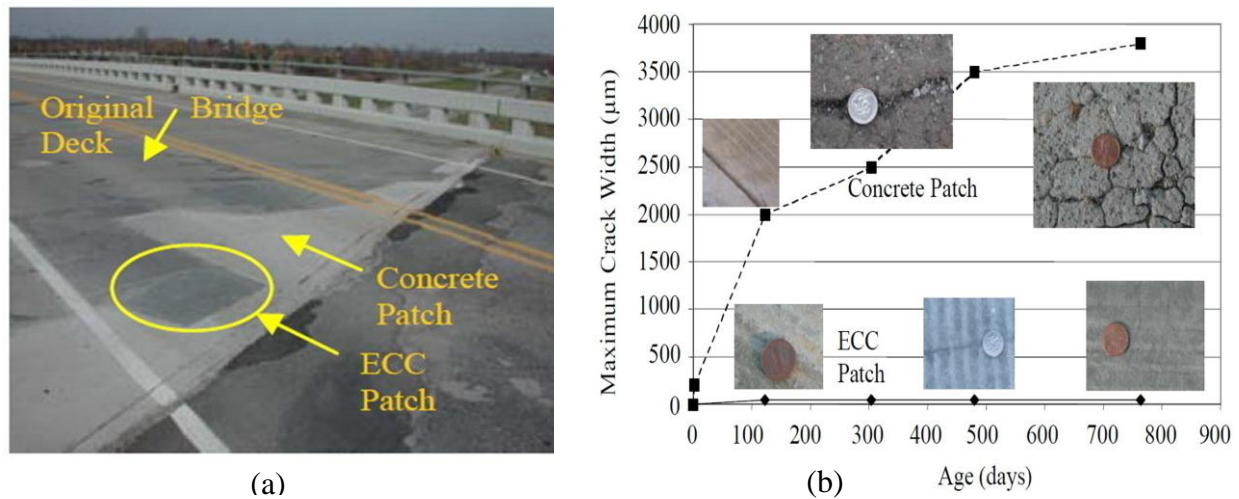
(a) Patch repair on a bridge deck. (b) Crack width development in concrete patch and ECC patch over time (Li and Lepech, 2004)
